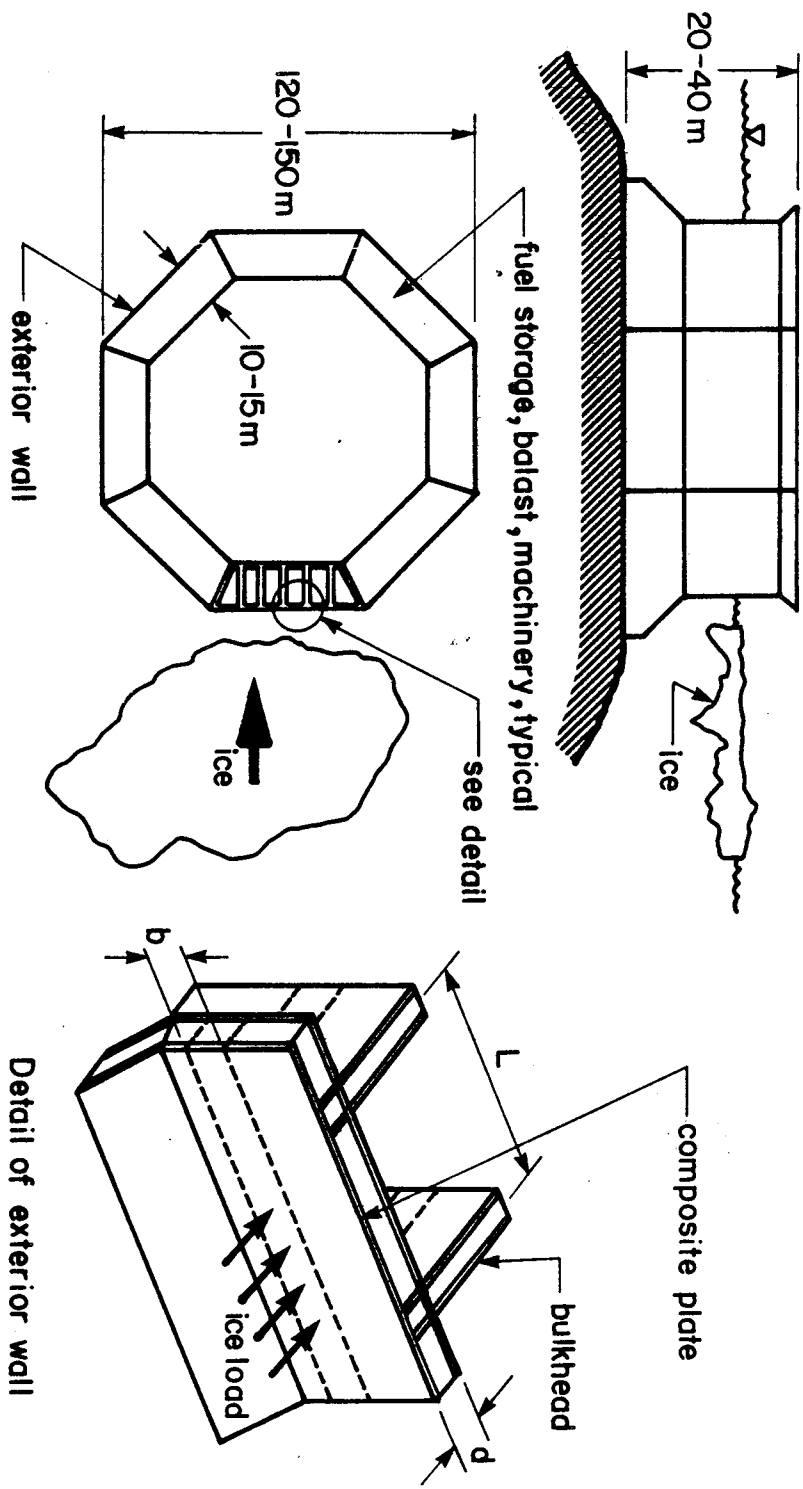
TYPICAL OFFSHORE CAISSON STRUCTURE WITH STEEL CONCRETE SANDWICH PLATES
